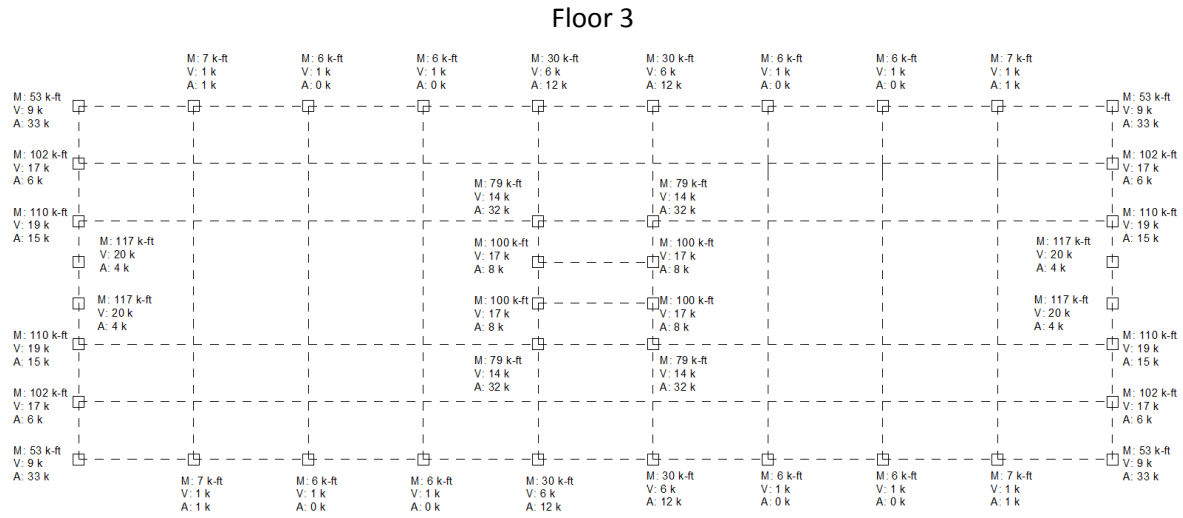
Maximum forces in the third floor columns due to tsunami base shear
